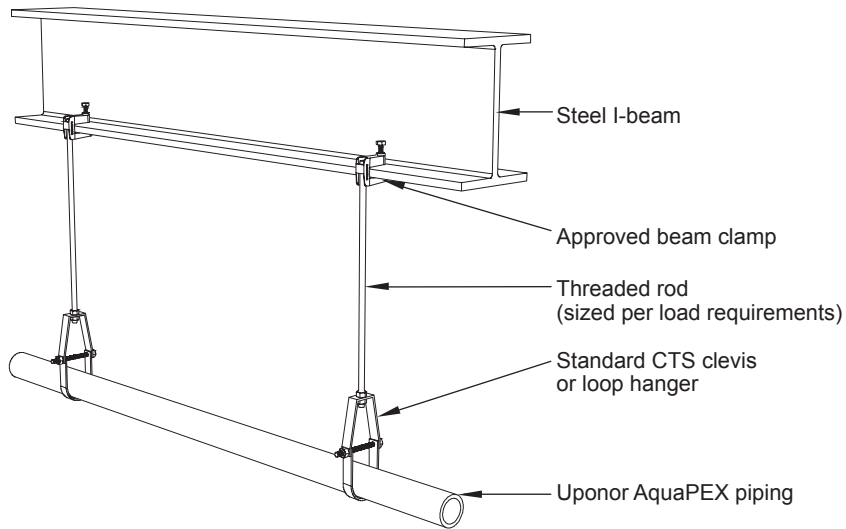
Steel Beam with Standard CTS Clevis Hangers
